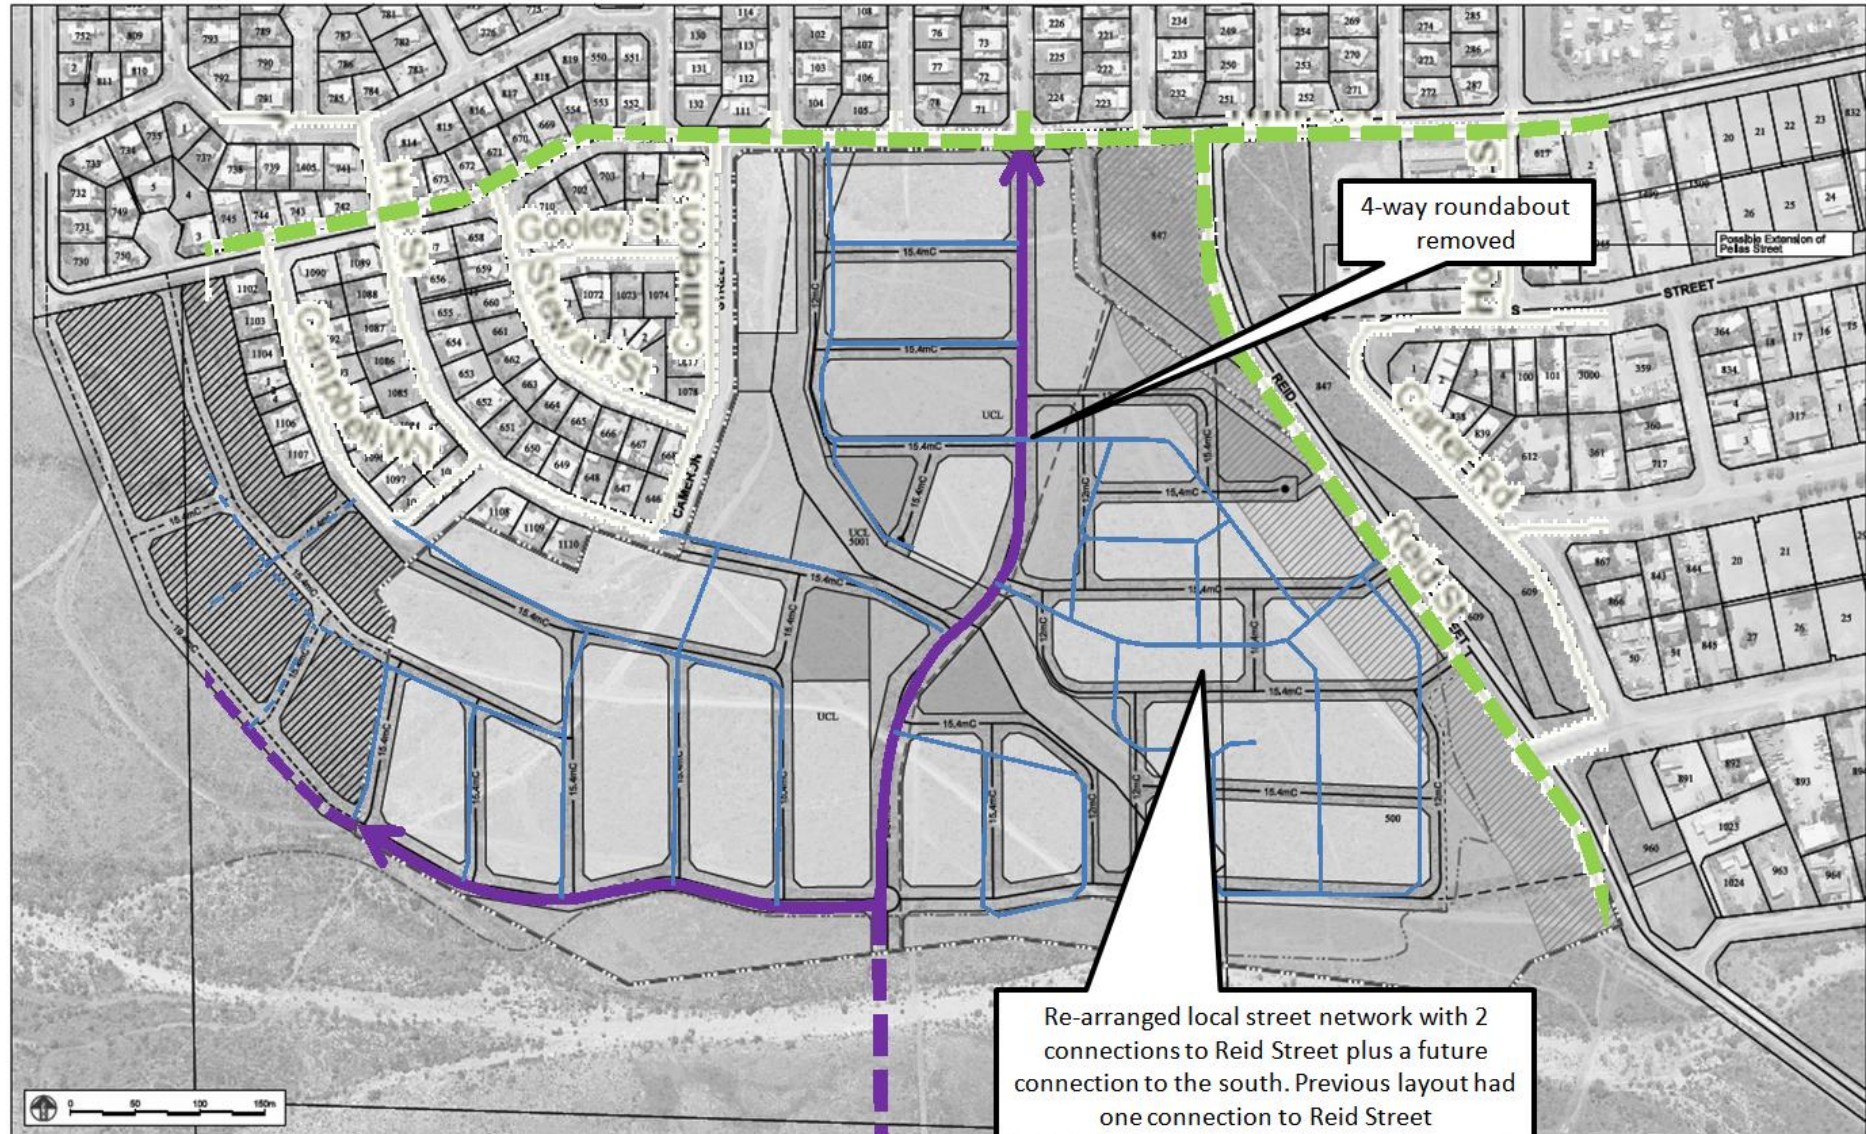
Previous road layout (colour) overlaid on revised road layout
